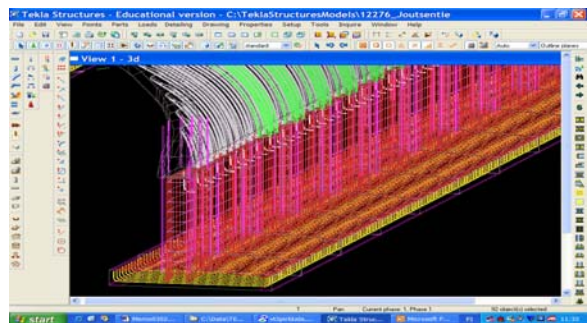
A Detail of a 3-D Concrete Bridge Model (Tekla Structures).
